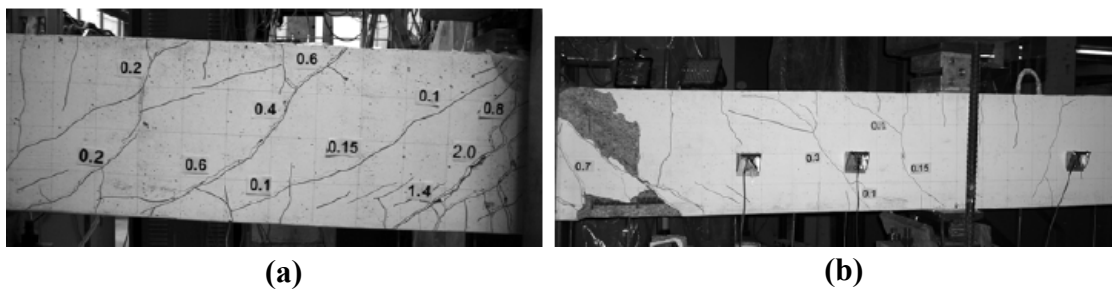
View of Beam SS2b-2 after Test: (a) North Half; (b) South Half
